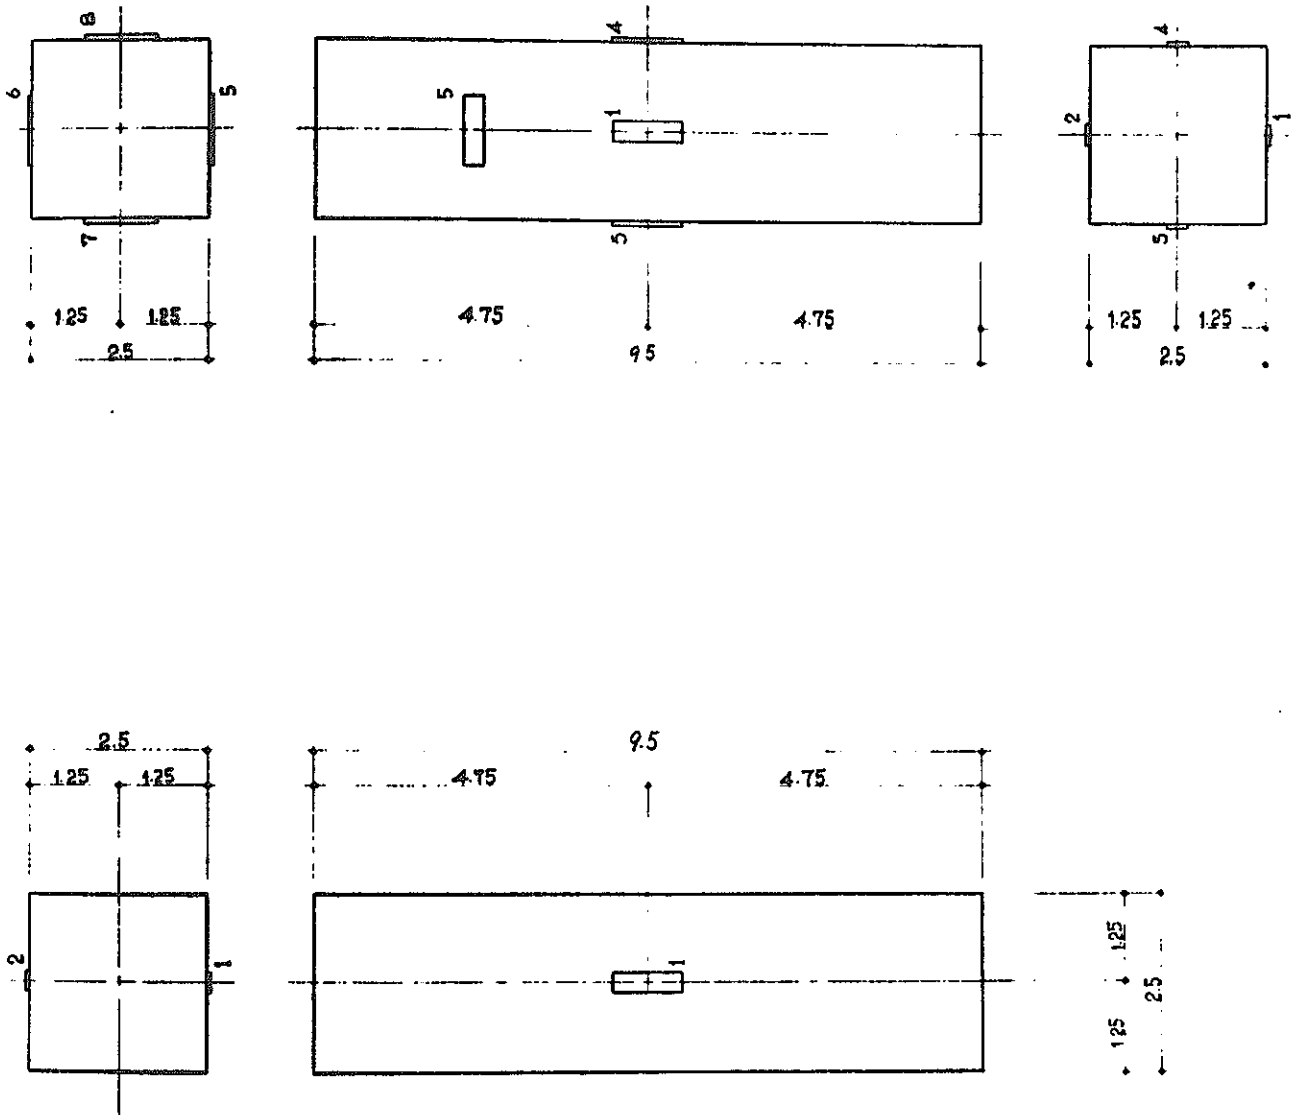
Fig. III-I-II Dimensions of Specimen Used for Key Compressive Test
